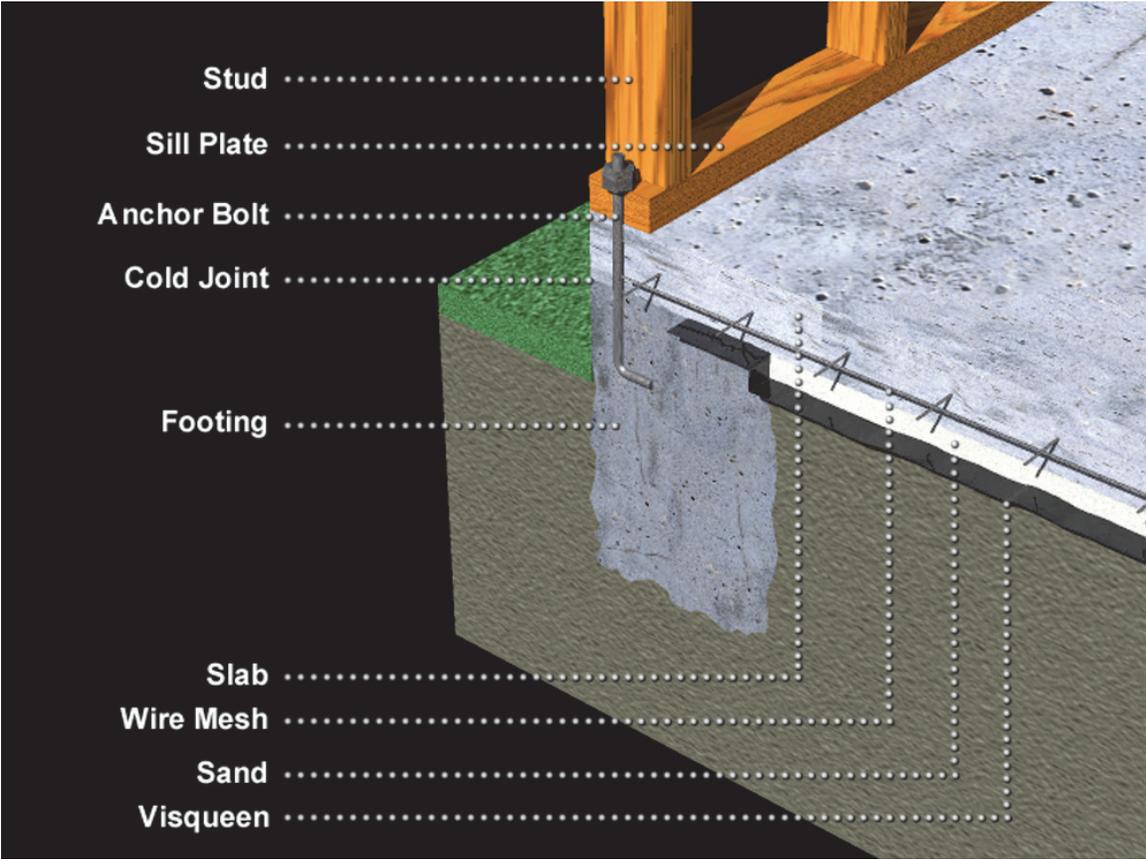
Slab-on-grade with independent perimeter footing and horizontal construction joint—two-pour system (image credit: Exponent).
